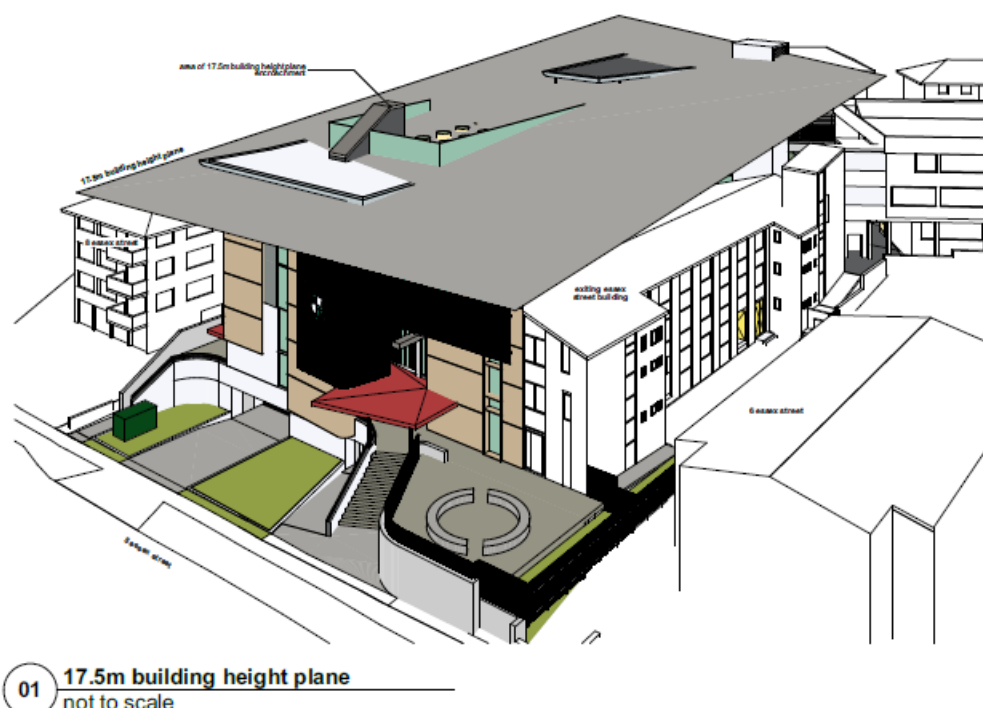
Extract from DA11 showing 17.5m Building Height Plane
